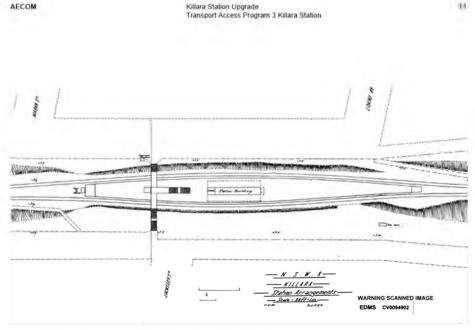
Killara Station layout, 1925 (Sydney Trains Virtual Plan Room)
